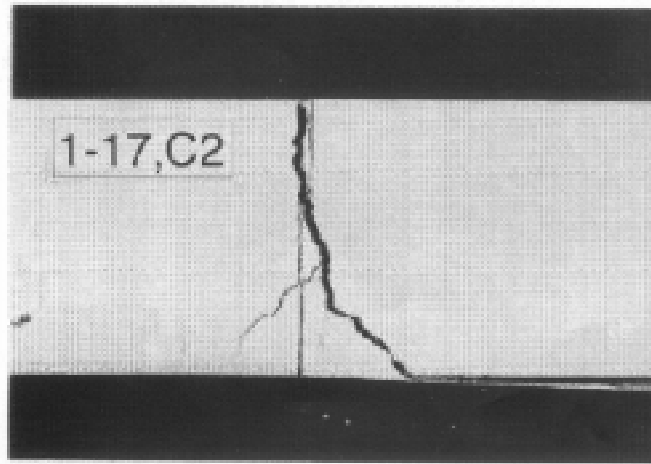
Typical failure mode including interfacial delamination of concrete specimen without center notch reinforced with carbonfiber sheet of two plies.
